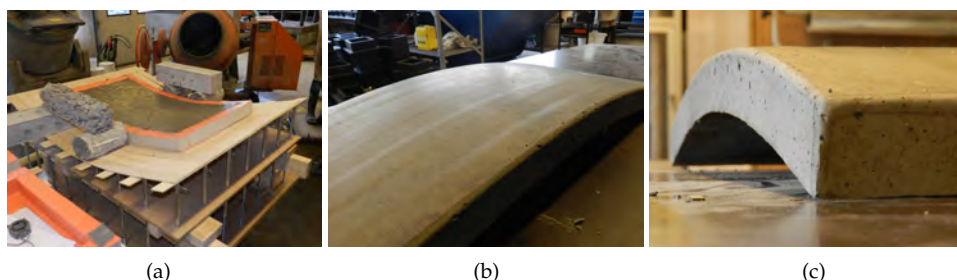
Batch 3 - element 3.1 during casting and after demoulding. (a) mould ballasted with extra weights; (b) and (c) smooth surface, smooth curvature, equal element thickness, some bubbles
